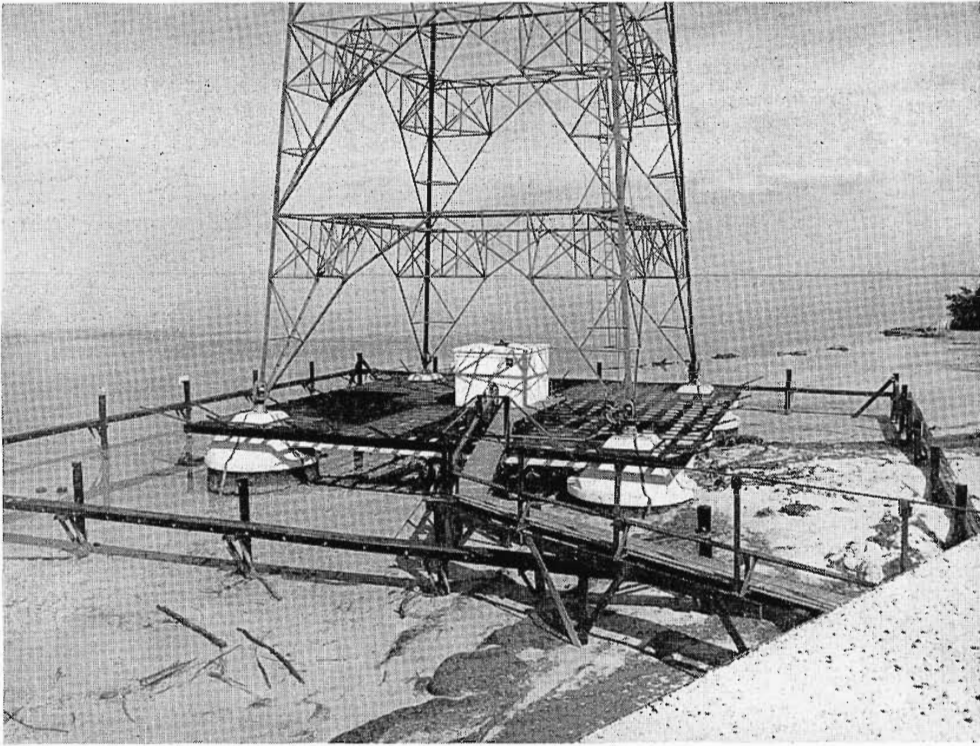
Northwest WSUN tower from roof of transmitter building, showing details of heavy timber grid resting on concrete beams supported by foundations . . . outrigger pilings for ground screen. Also catwalk leading to transmitter building.
